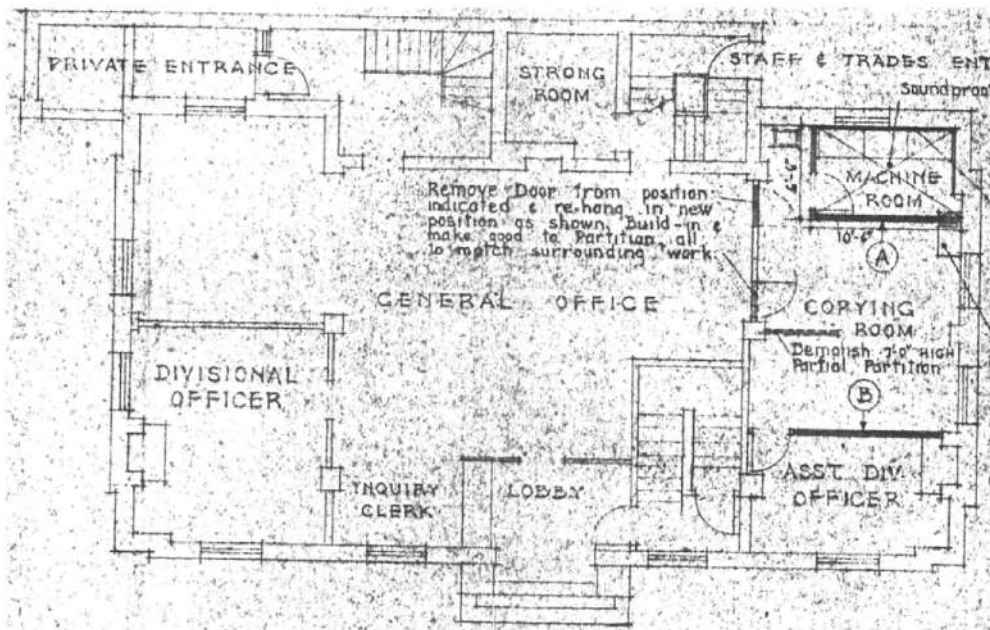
Ground floor plan of the Bureau of Meteorology, documented by the Commonwealth Department of Works and Housing, March 1951. (Source: TKD 2016: Fig 39).
